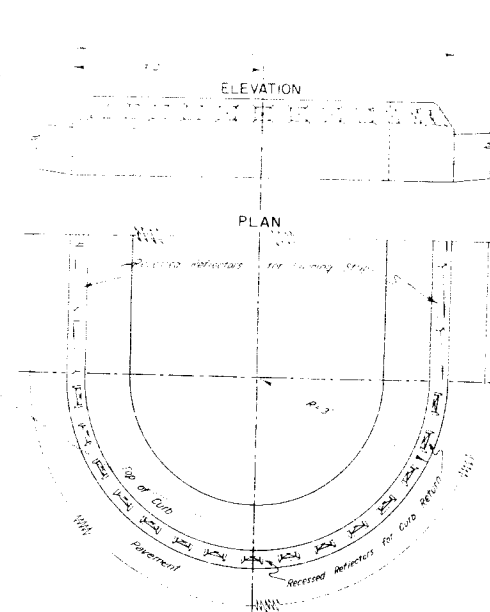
DETAIL OF RECESSED REFLECTOR CURB & CURB RETURNS
